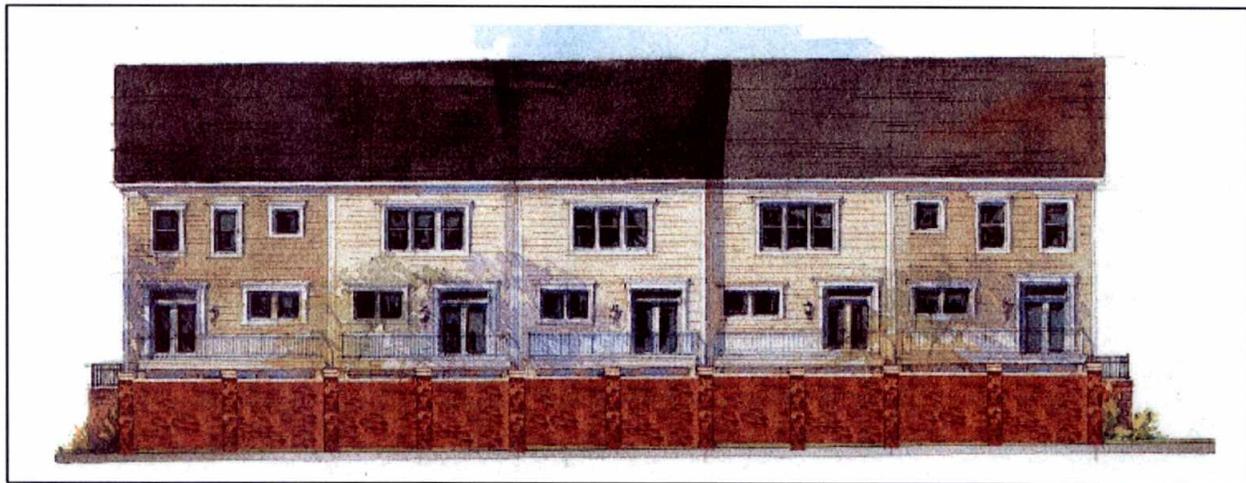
The rear elevation of the townhouses from Sheet 9 of the GDP,
